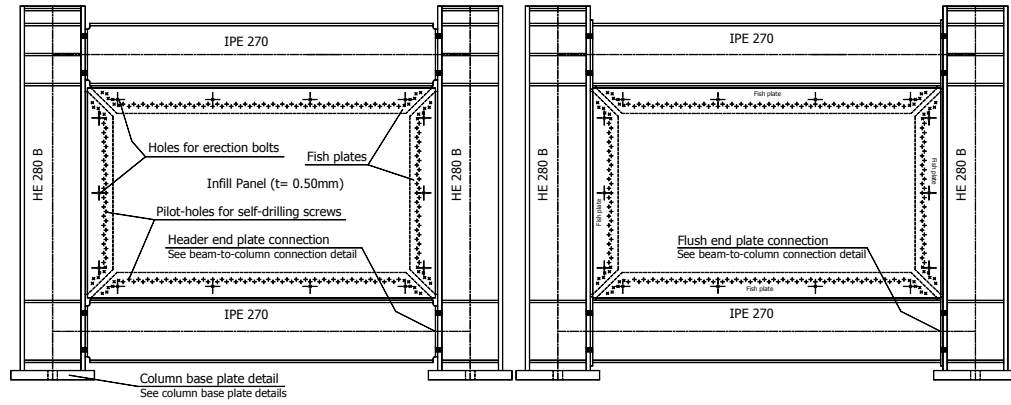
Test Specimens of TSPSWs with Panels Connected to Boundary Frames
